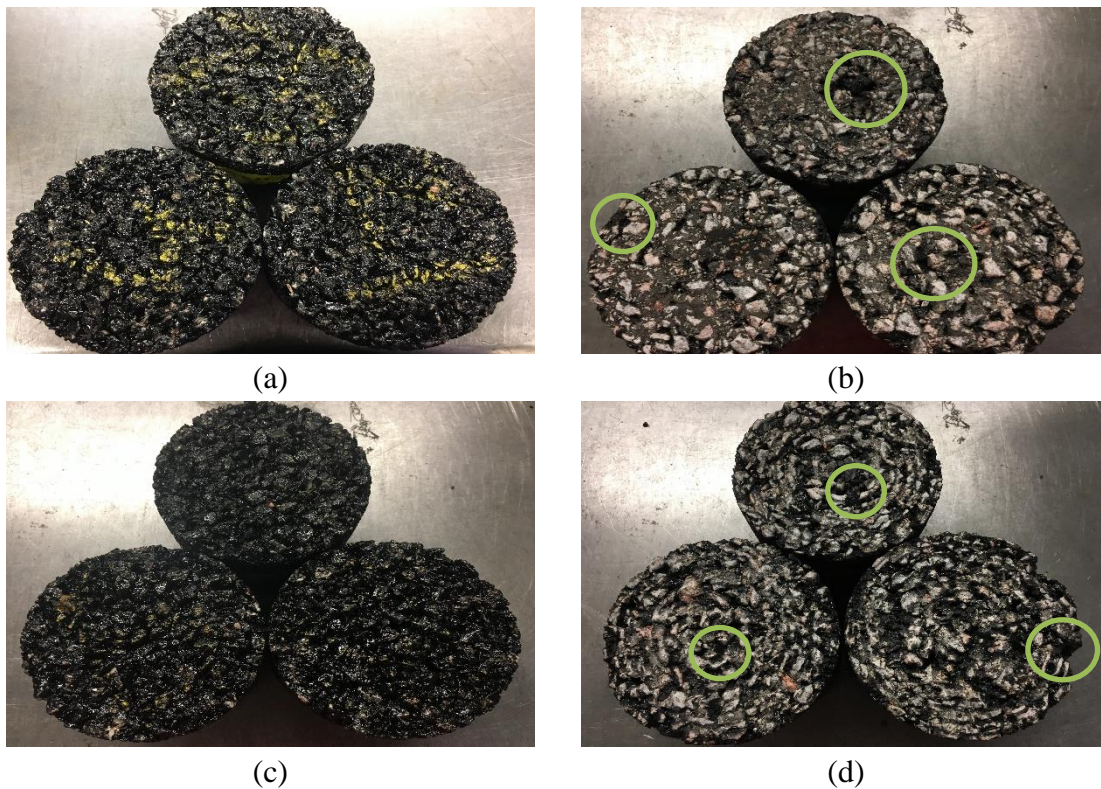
Singular Motion Surface Abrasion Test on the Top of the Specimen Using Cutter B (a) Un-Aged Before, (b) Un-Aged After, (c) Aged Before, and (d) Aged After
